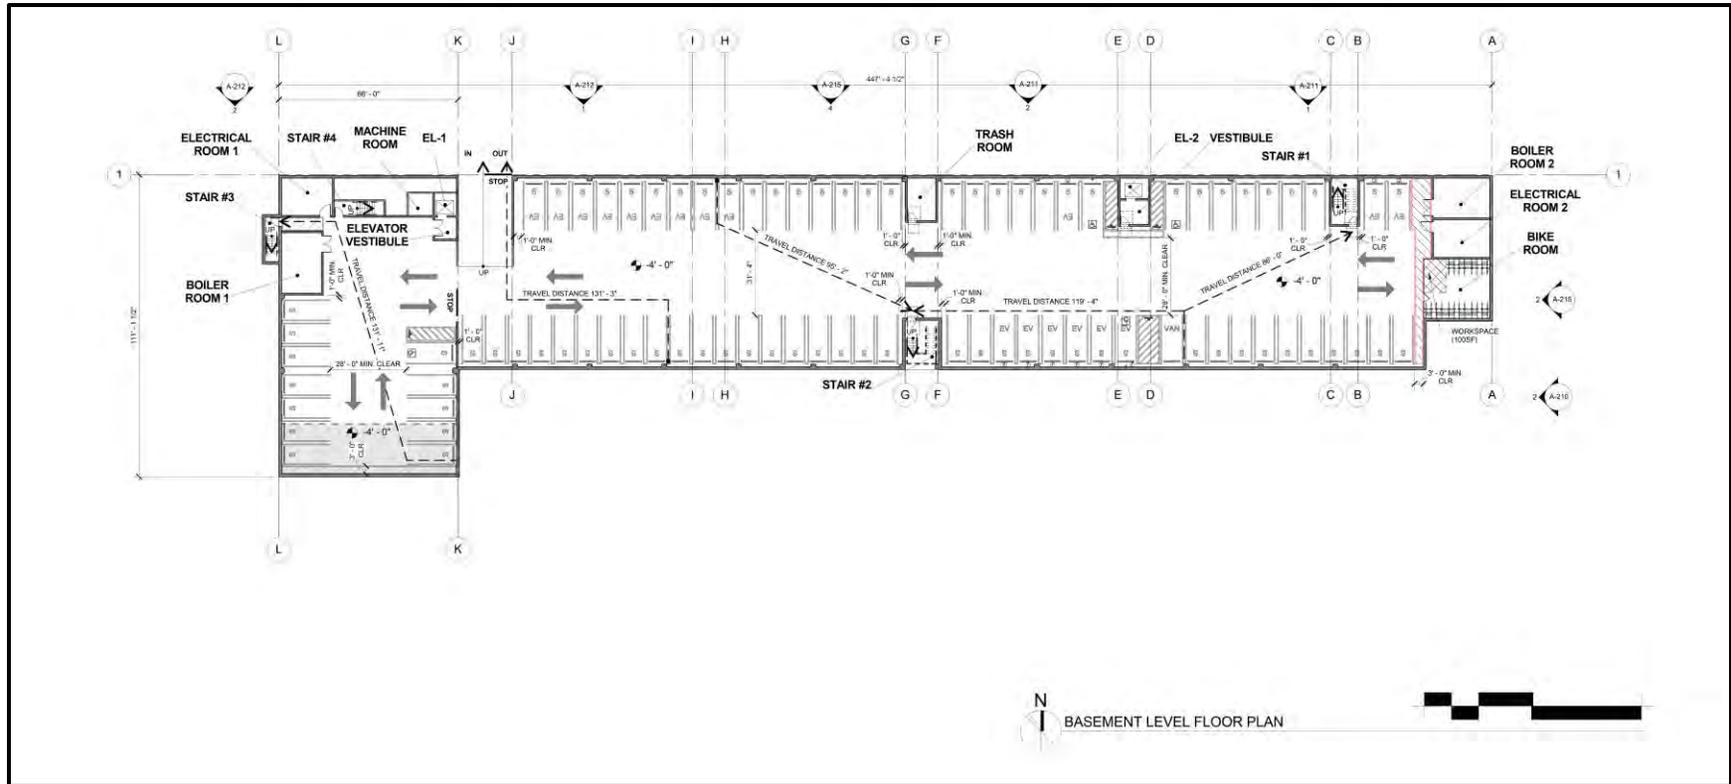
Floor plans for basement level of Thatcher Yard Project development.
